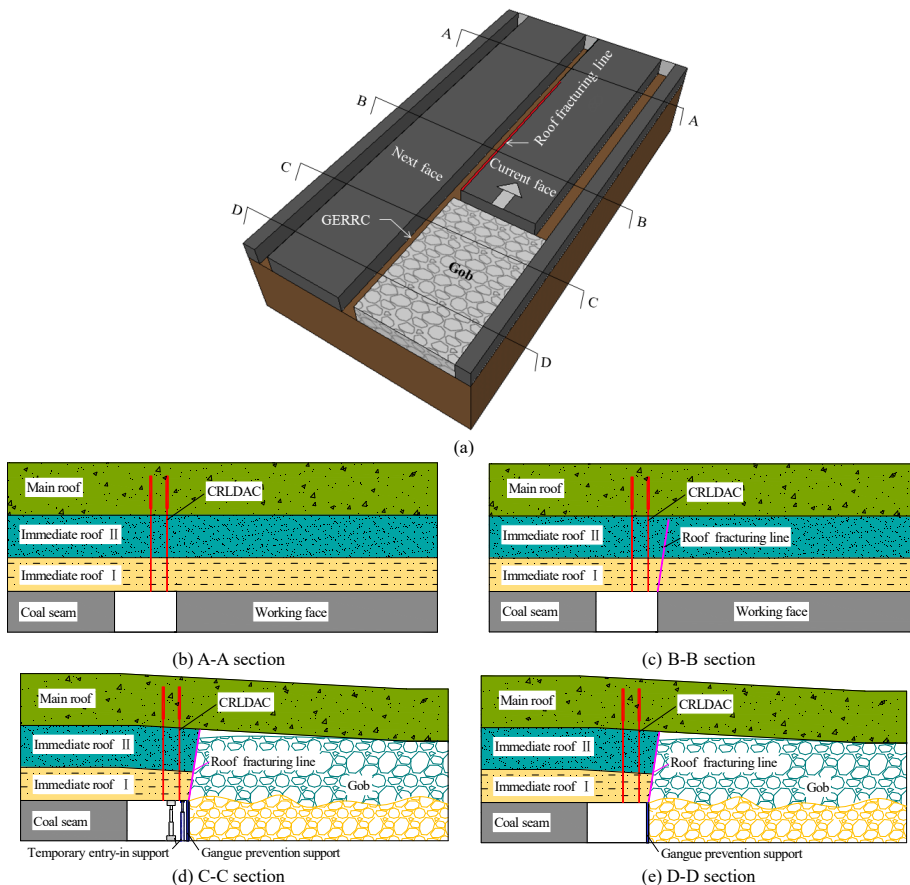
Technological principle of the GERRC approach: (a) three-dimensional view of GERRC technology; (b) roof support with CRLDAC; (c) energy-gathering blasting to split roof; (d) entry-in support and gangue prevention support; (e) sprayed concrete to close the gangue rib
